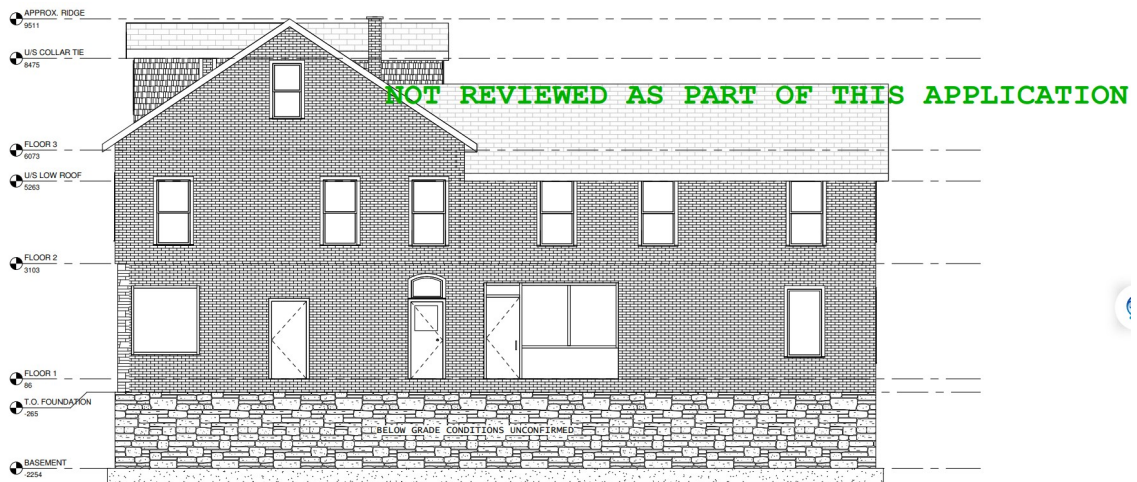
Drawing of 164 Bathurst Street, illustrating the building's north (secondary) elevation, prepared by T. Smith Engineering, 2019. (City of Toronto Building Records.)
